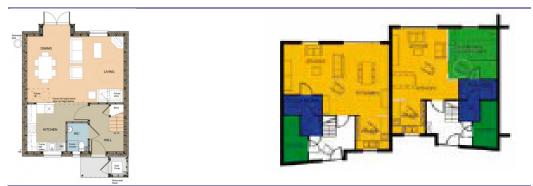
Left: ground floor plan of Renewable House as built on BRE innovation park, Watford, UK.
